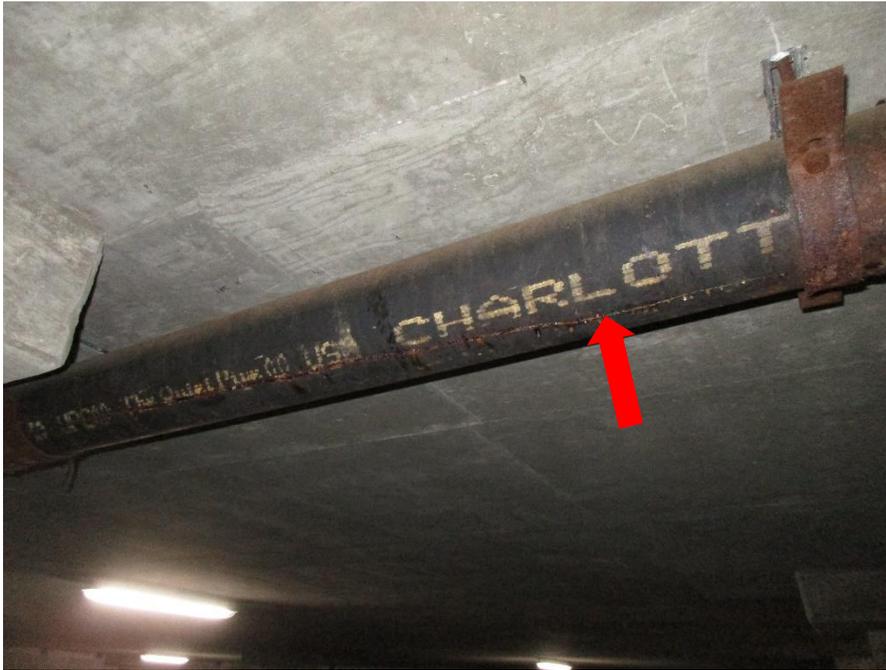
Failed drain pipe with water and corrosion along crack.
